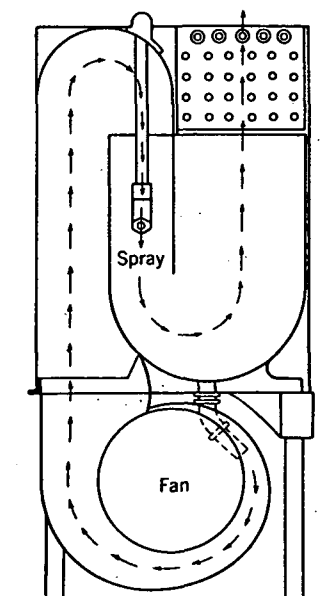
SIMPLE SPRAY AND COIL UNIT CONDITIONER
